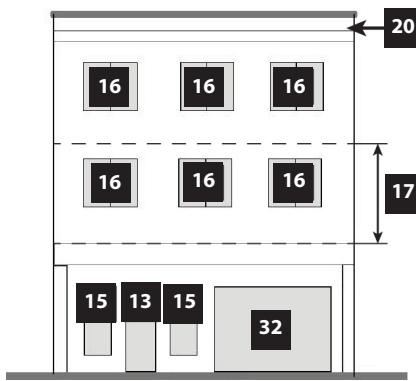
Limited bay building street facade diagram shown with vehicle bay, storefront entry type, and parapet roof type. Not to scale.
